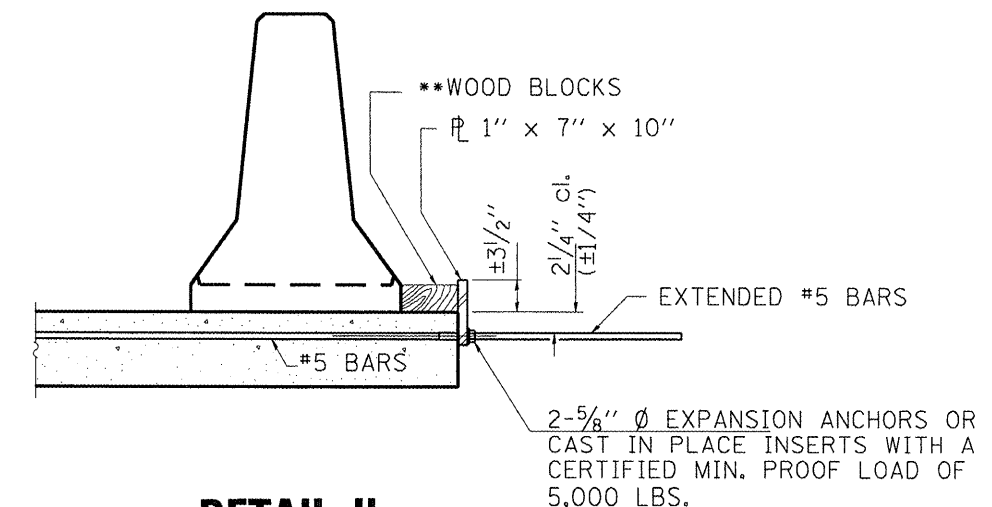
DETAIL II - WITH EXTENDED REINFORCEMENT BARS:
